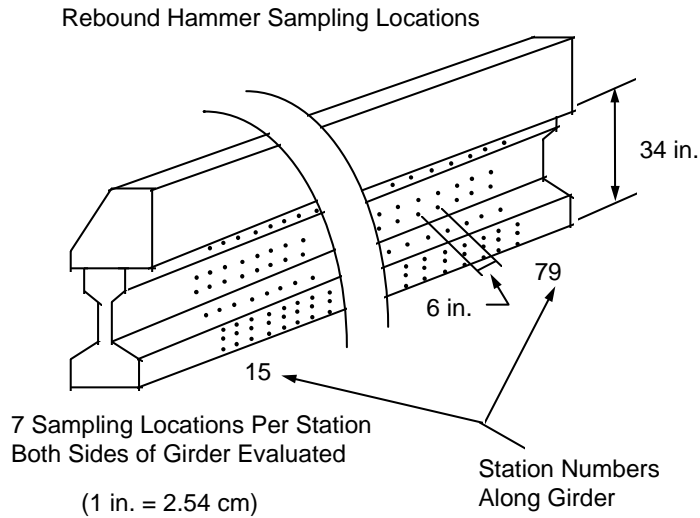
8 Schematic of rebound hammer testing locations for damage assessment of Steck girder
